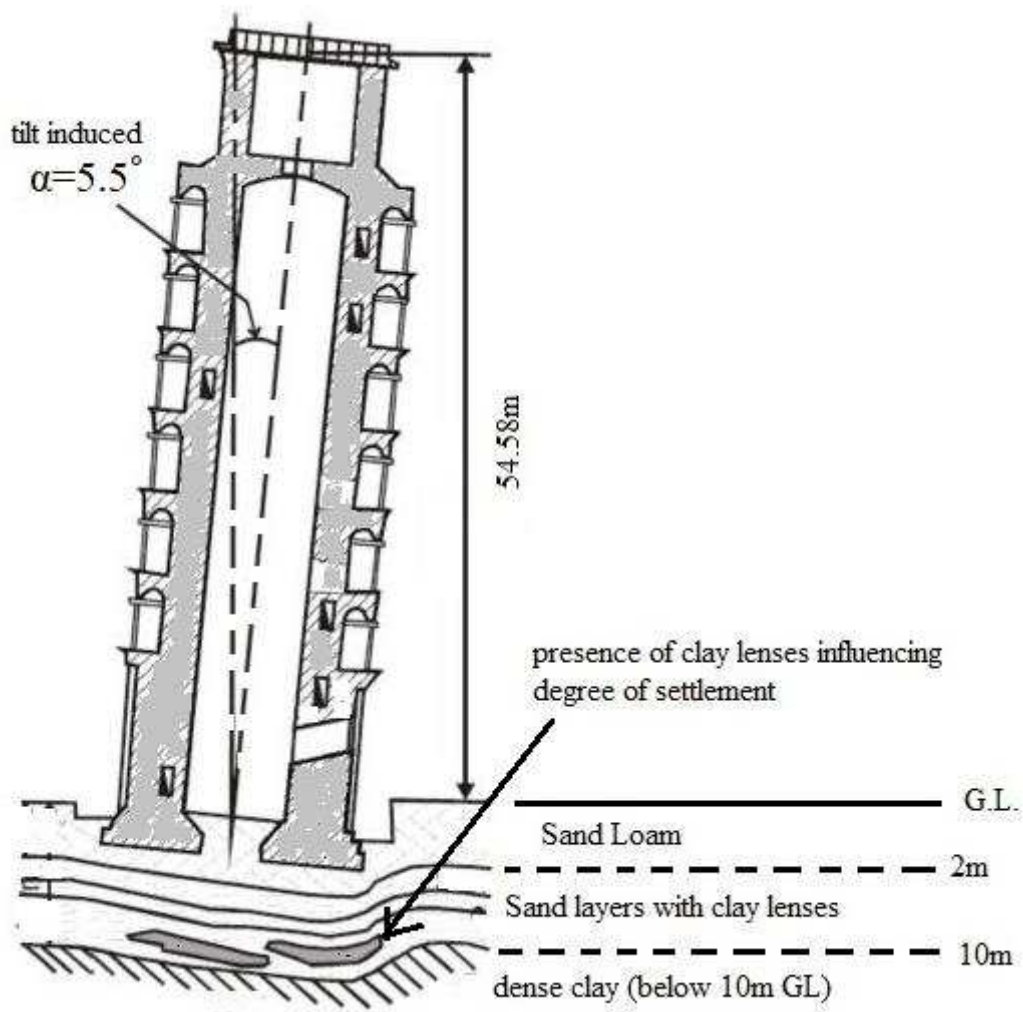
The Leaning Tower of Pisa sectional view (Meschyan 1995)
